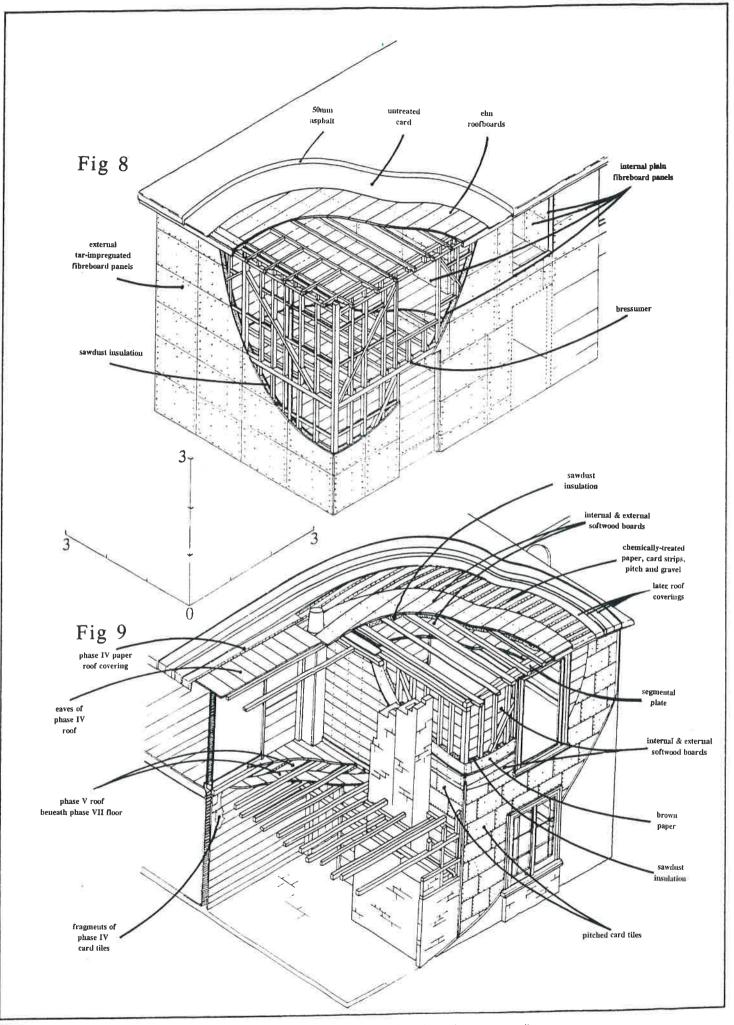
Paisley House: axonometric projection showing construction of phase I building from the south-west (restored)
